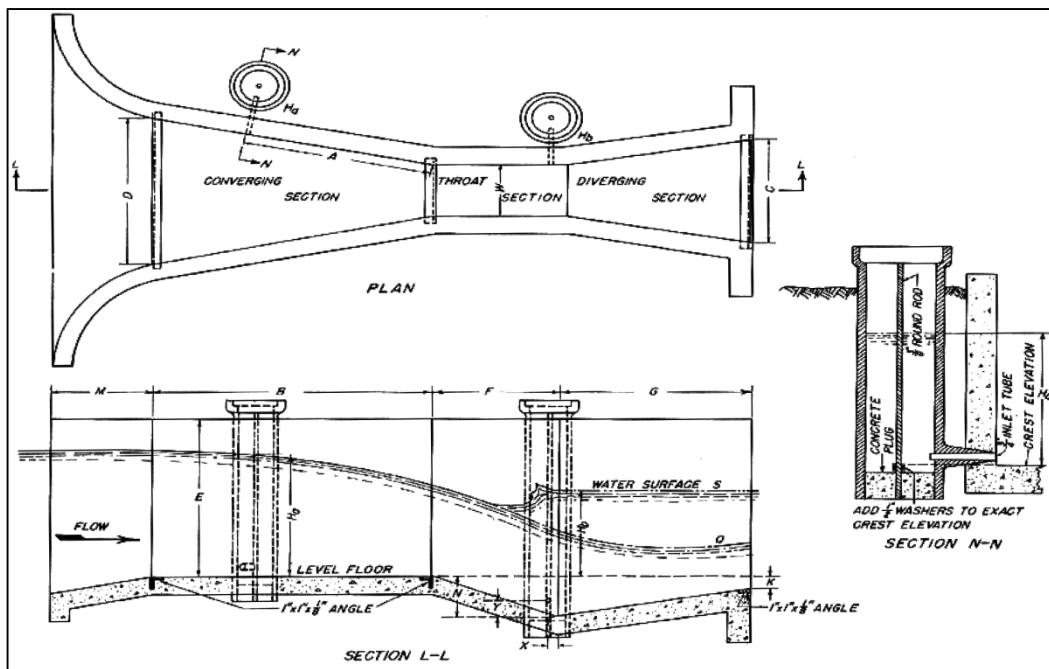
Plan and elevation views of a concrete (cast-in-place) Parshall flume. (Courtesy of USDA-NRCS).
